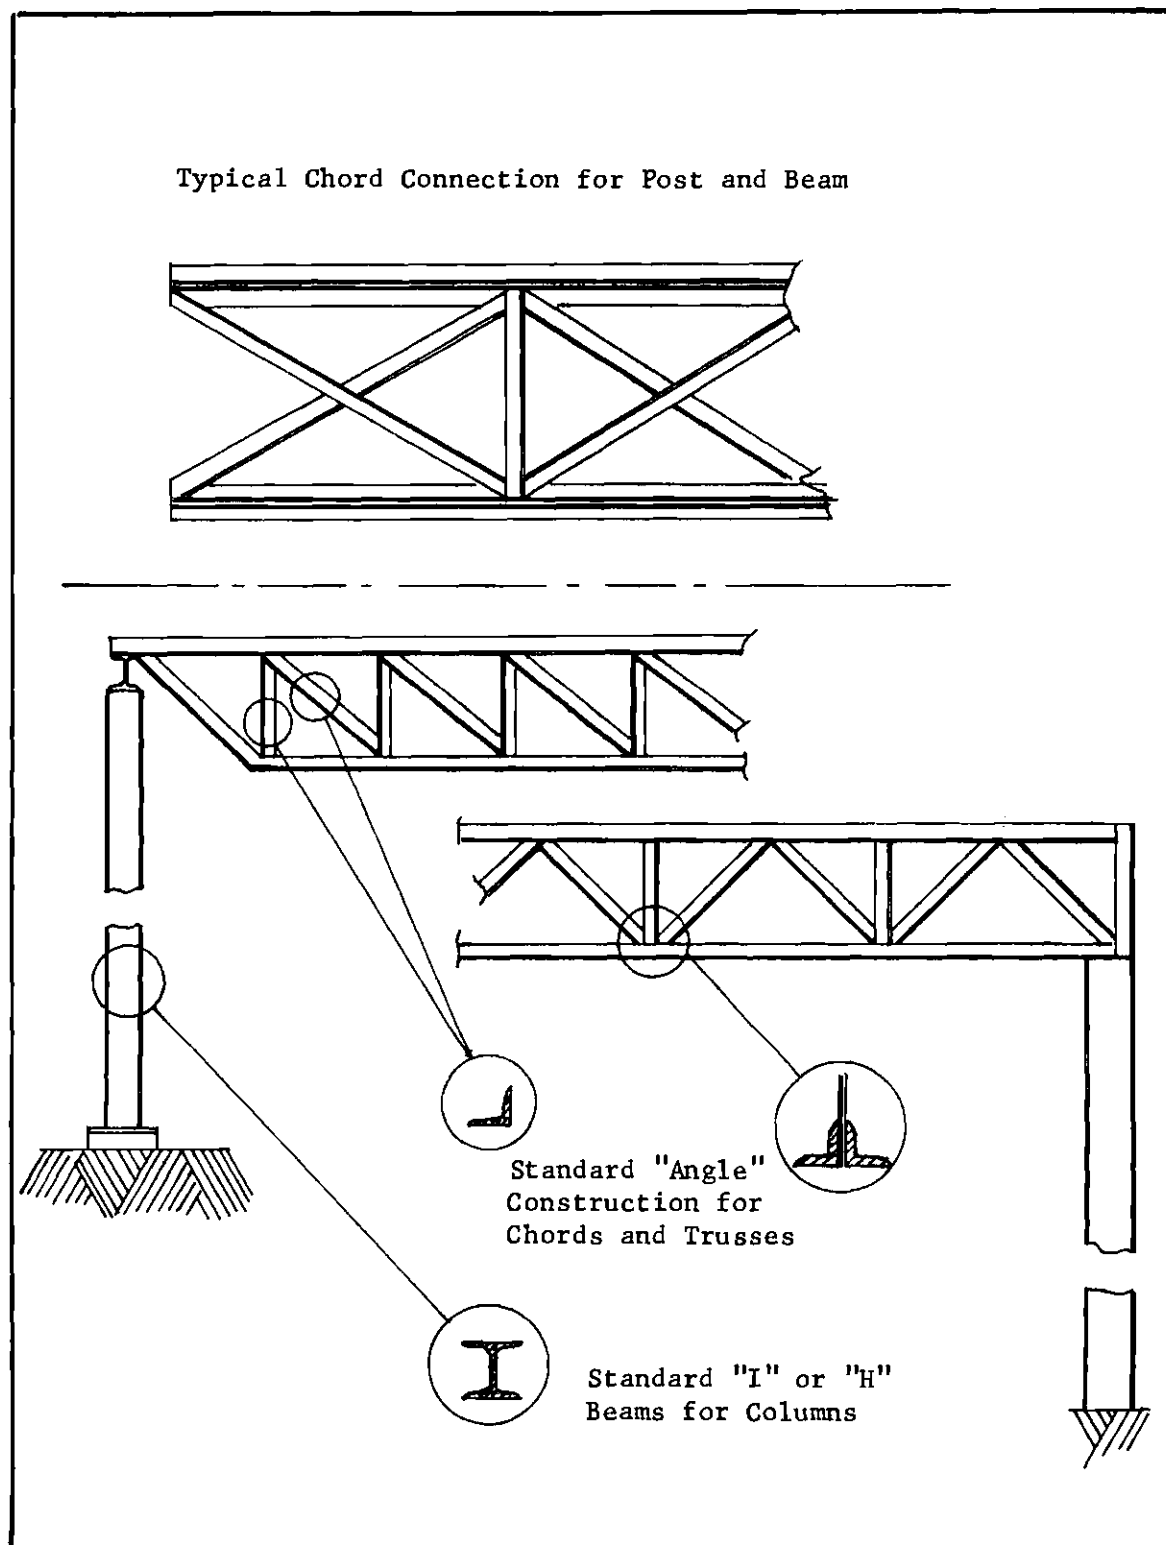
Typical Structural Members for Post and Beam Frame Buildings
